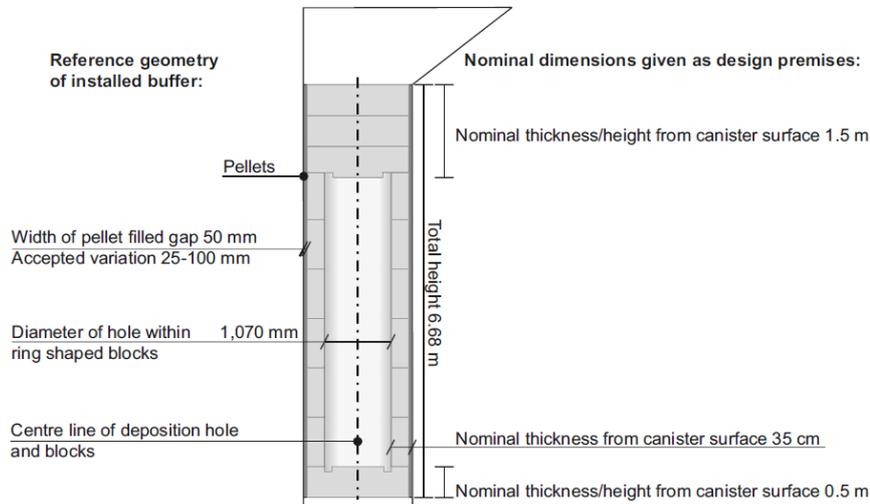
Reference geometry of the installed buffer and the nominal dimensions given as design premises. Note that the installed dimensions and density will depend on the geometry of the deposition hole. (The upper part of the deposition hole is regarded as part of the deposition tunnel and will be backfilled, see Figure 5-13).
